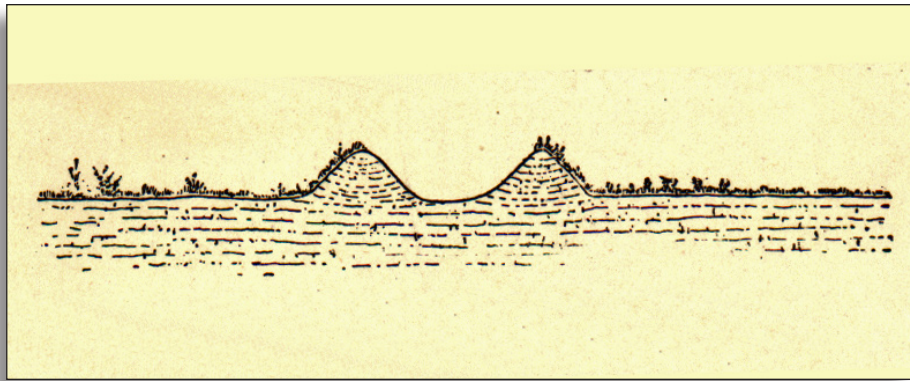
Cross section drawing of an early earthen sub-lateral canal (1902).
